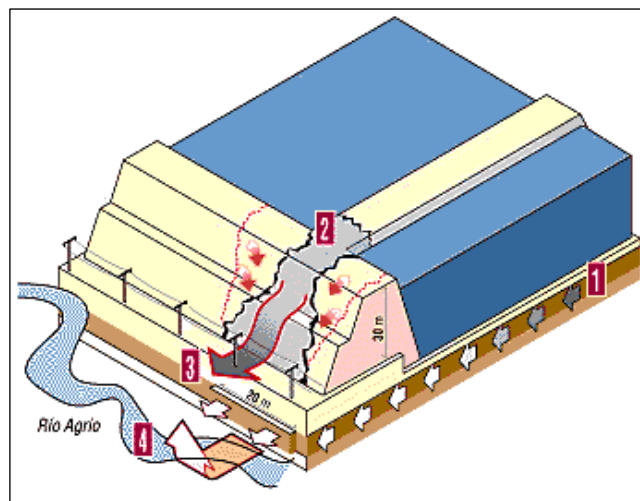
Schematic view of the foundation failure of tailings dam in Los Frailes Mine (Spain) (www.wise-uranium.org, 2008)
